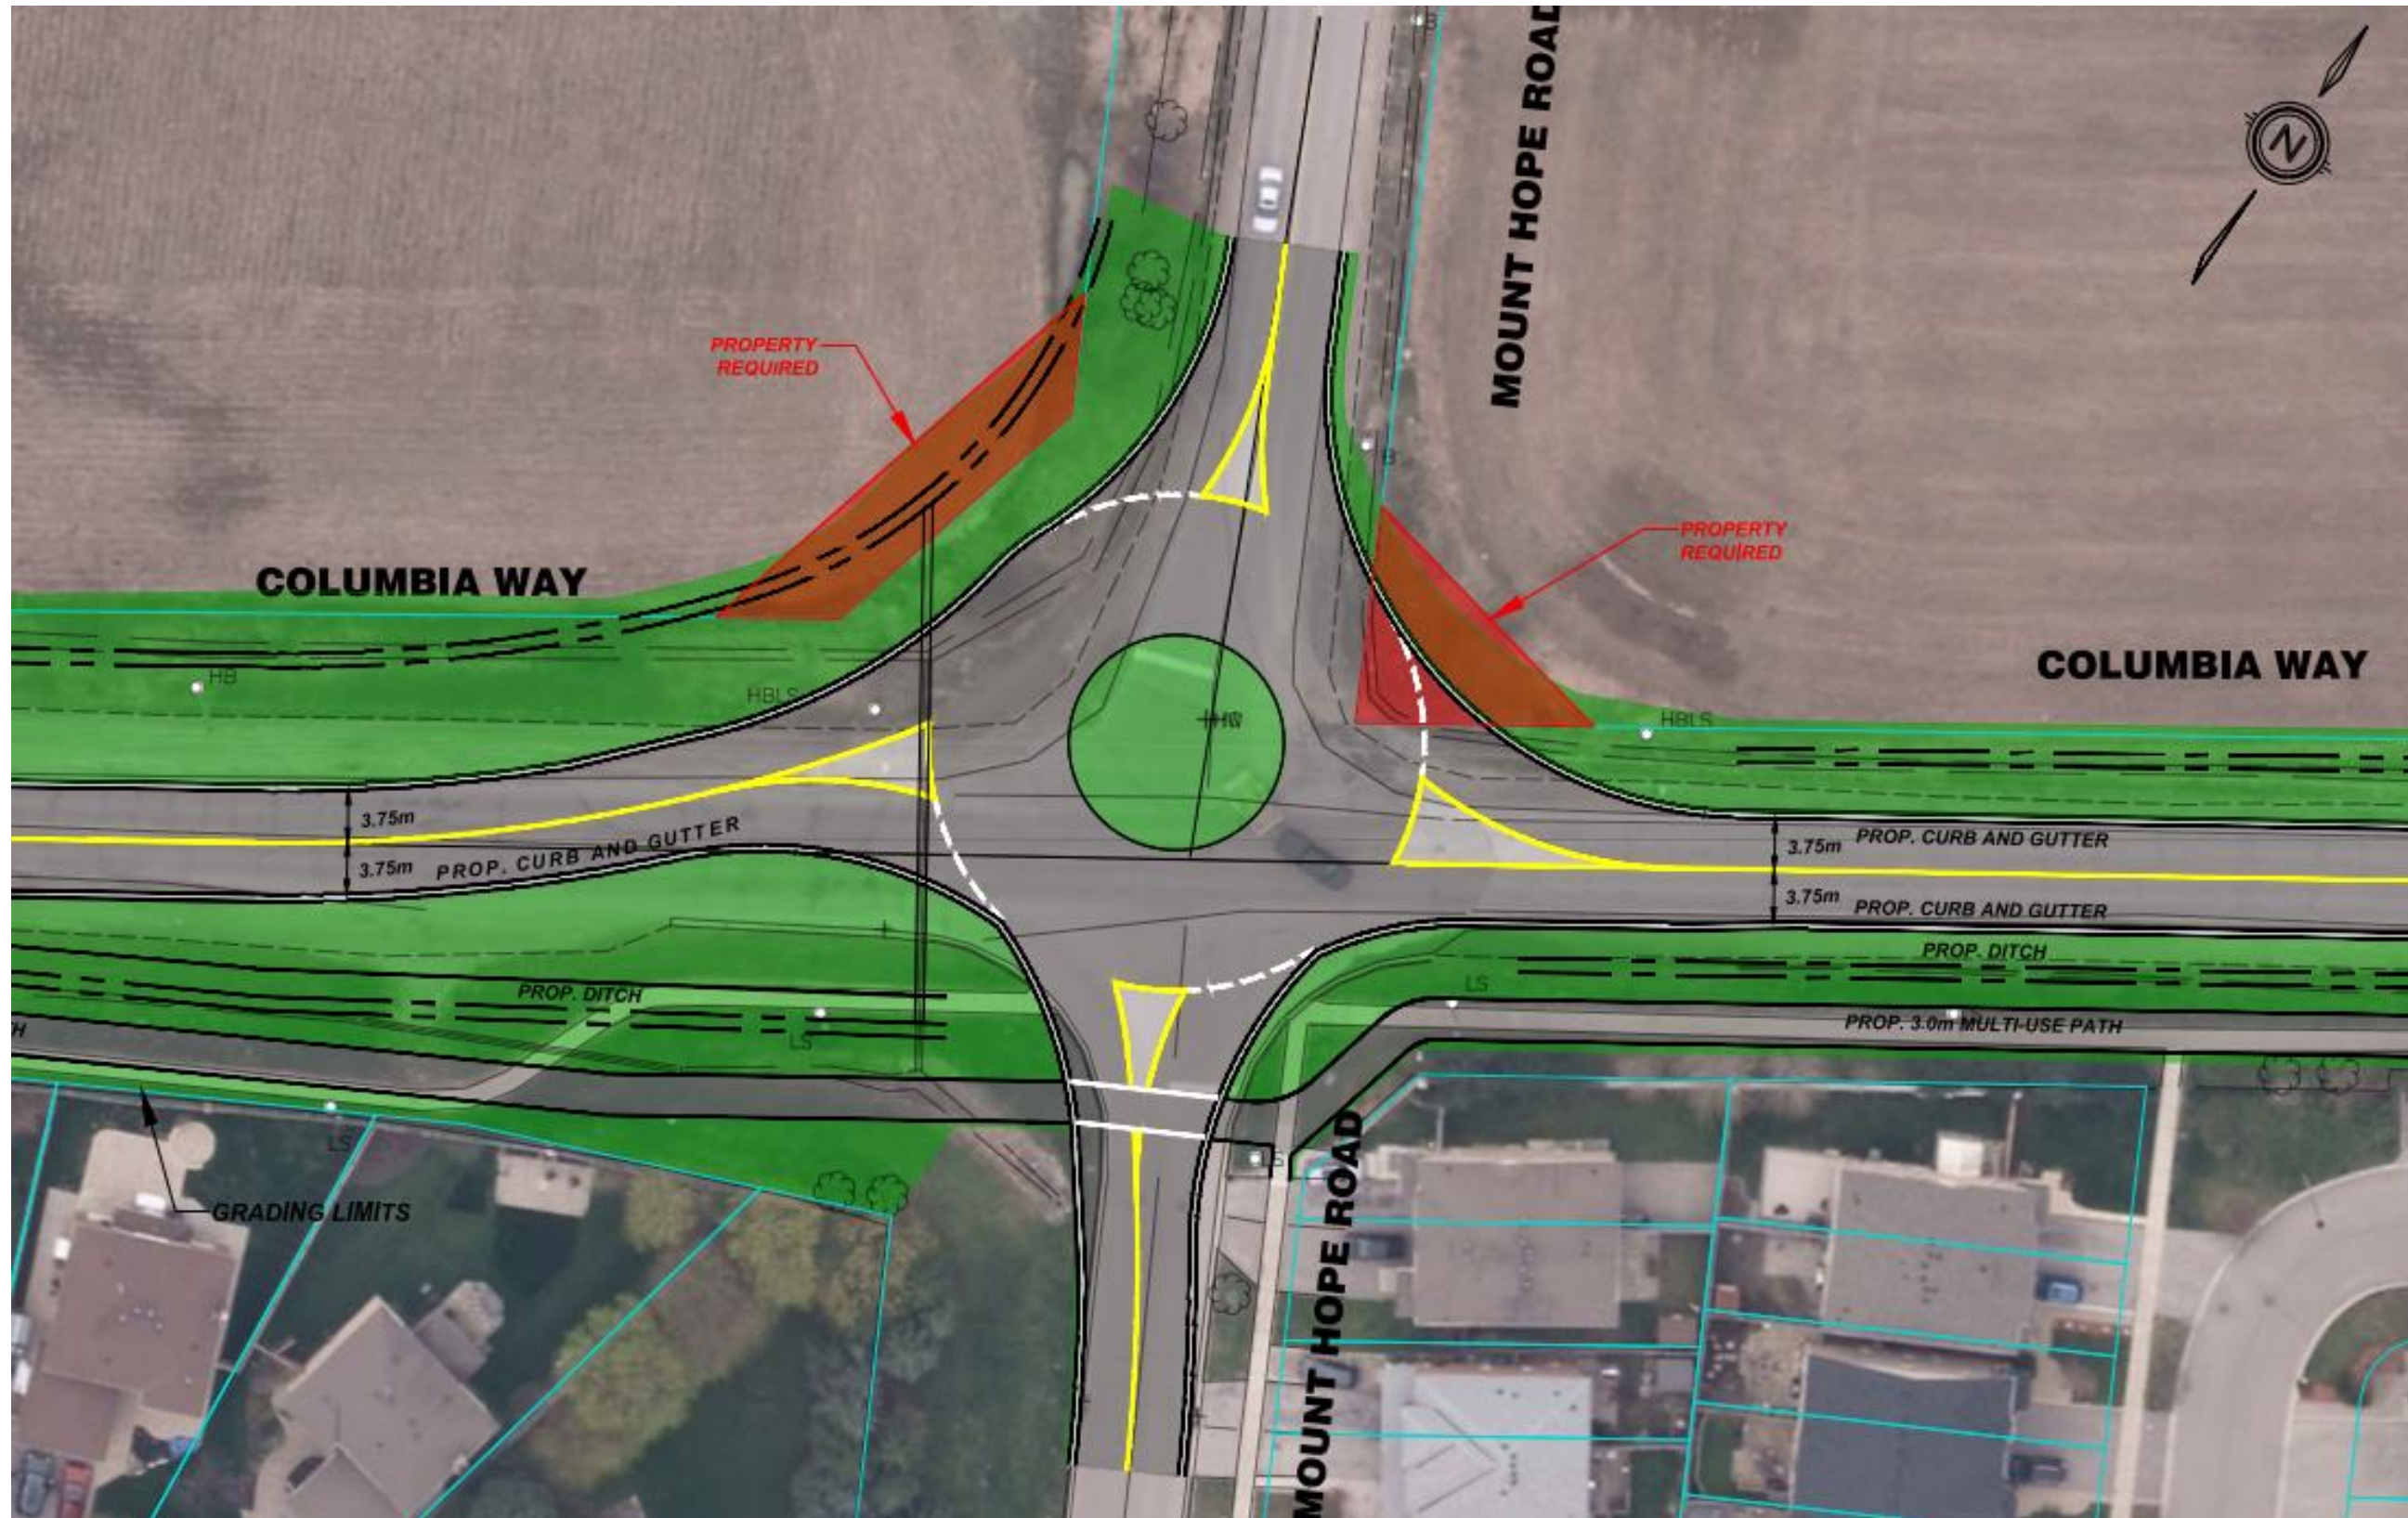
Mount Hope Road Intersection Preferred Solution
